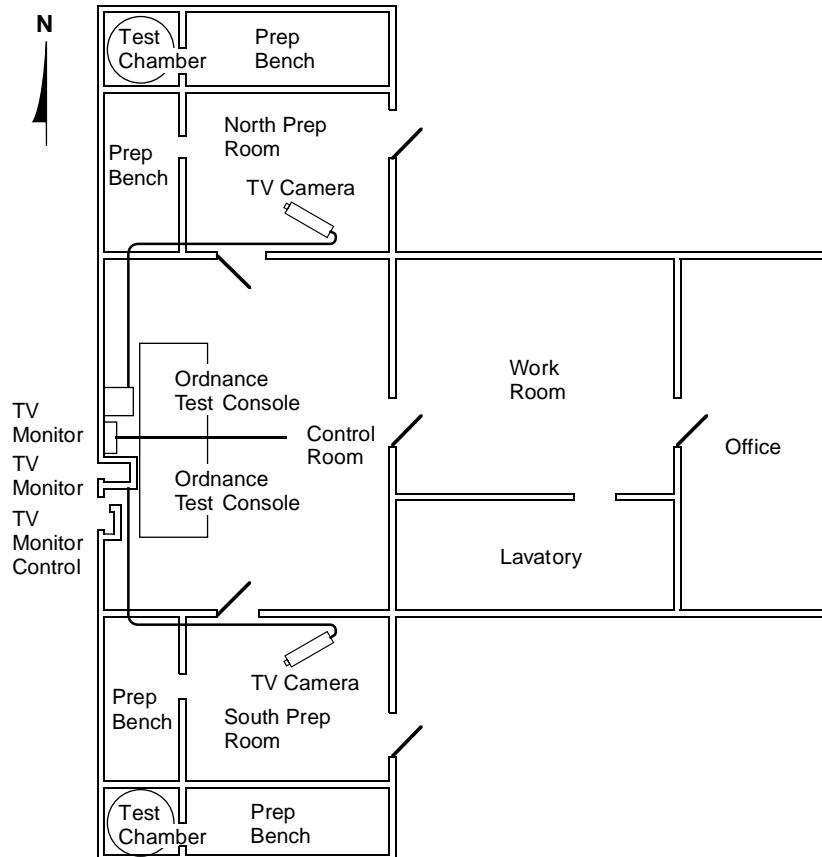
Electrical-Mechanical Testing Building Floor Plan
